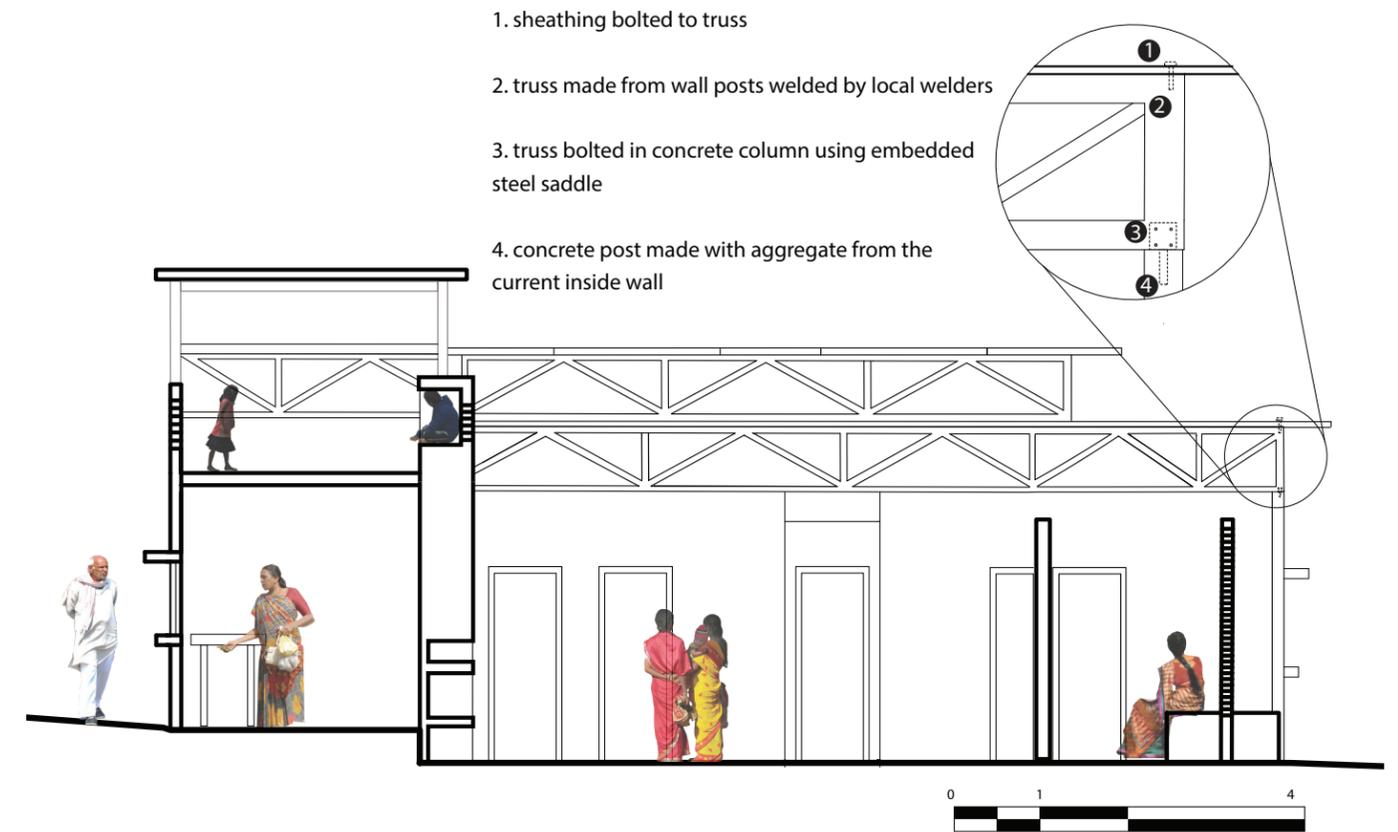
Anganwadi section 3 showing truss to wall connection details
